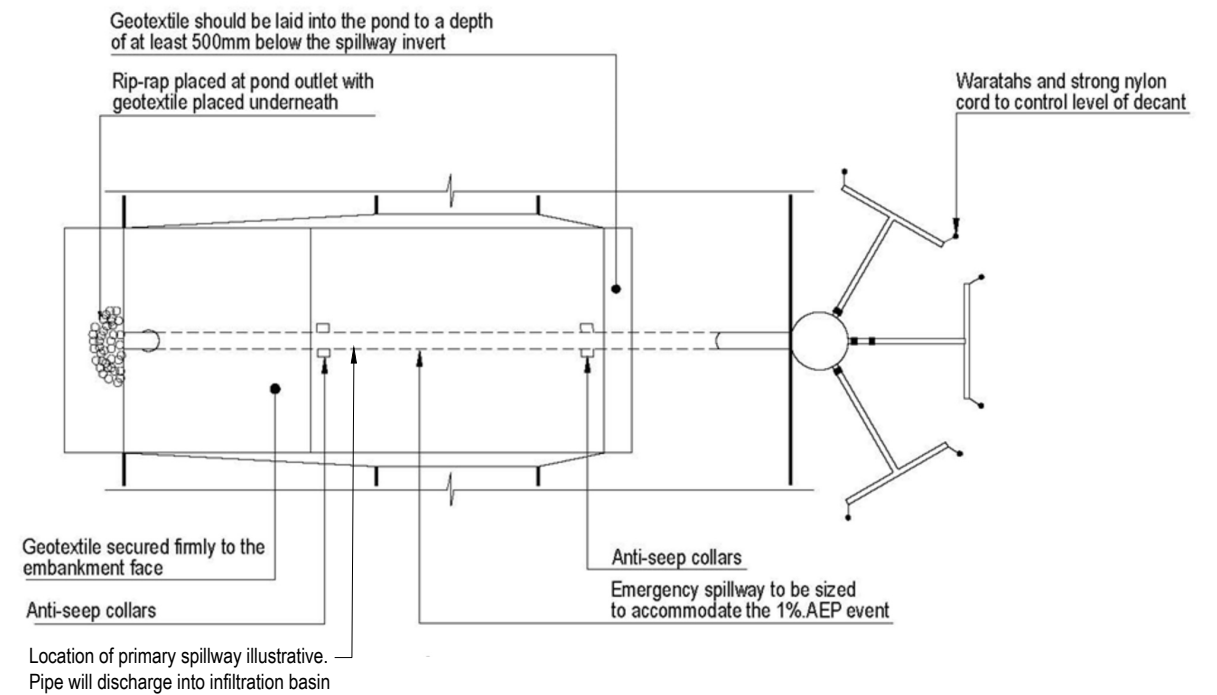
PLAN OF OUTLET FOR 3-5ha CATCHMENT
